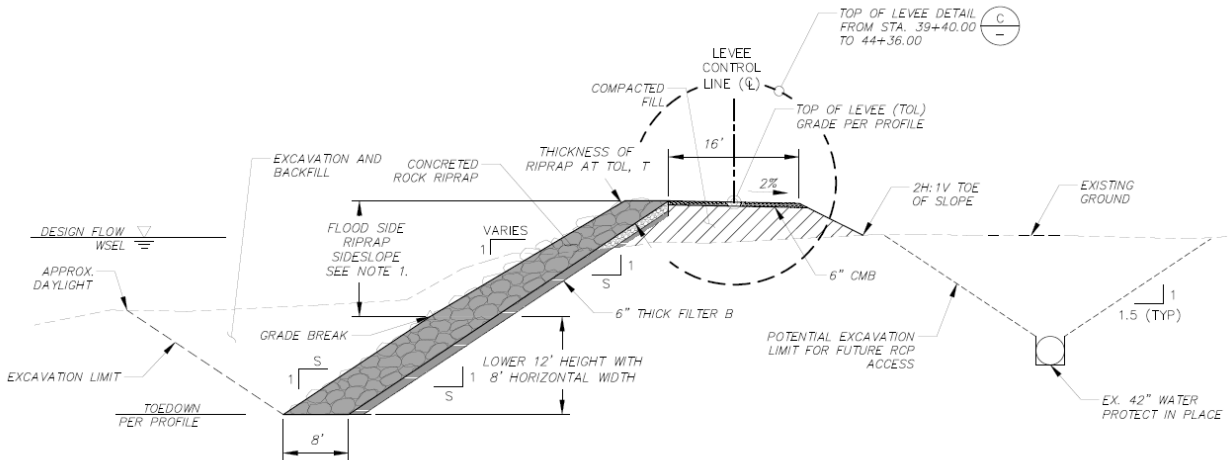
Selected Alternative Typical Concreted Riprap Section (Reach I, III, and IV)
